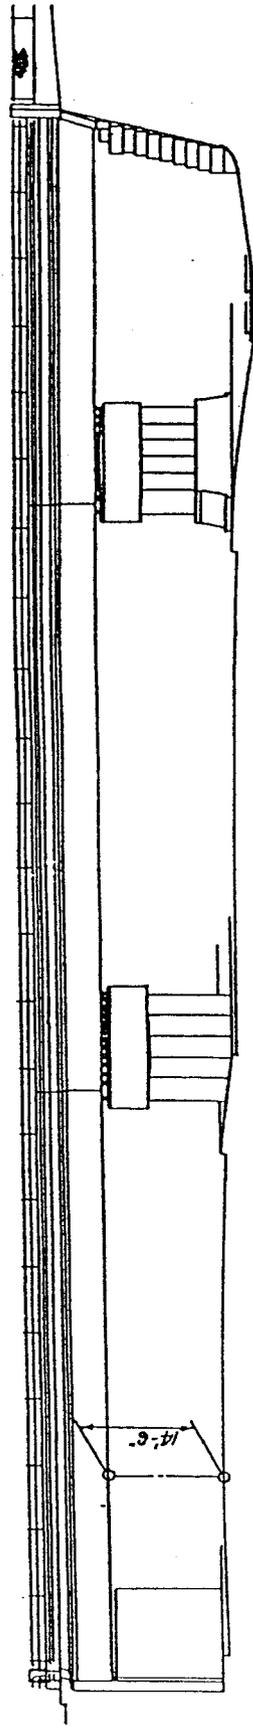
Broad Steet - South Bridge #657: Bridge Plan
